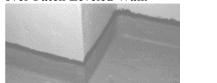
Hot air Puttied Inside/Outside Corners over Patch Leveled Wall.
